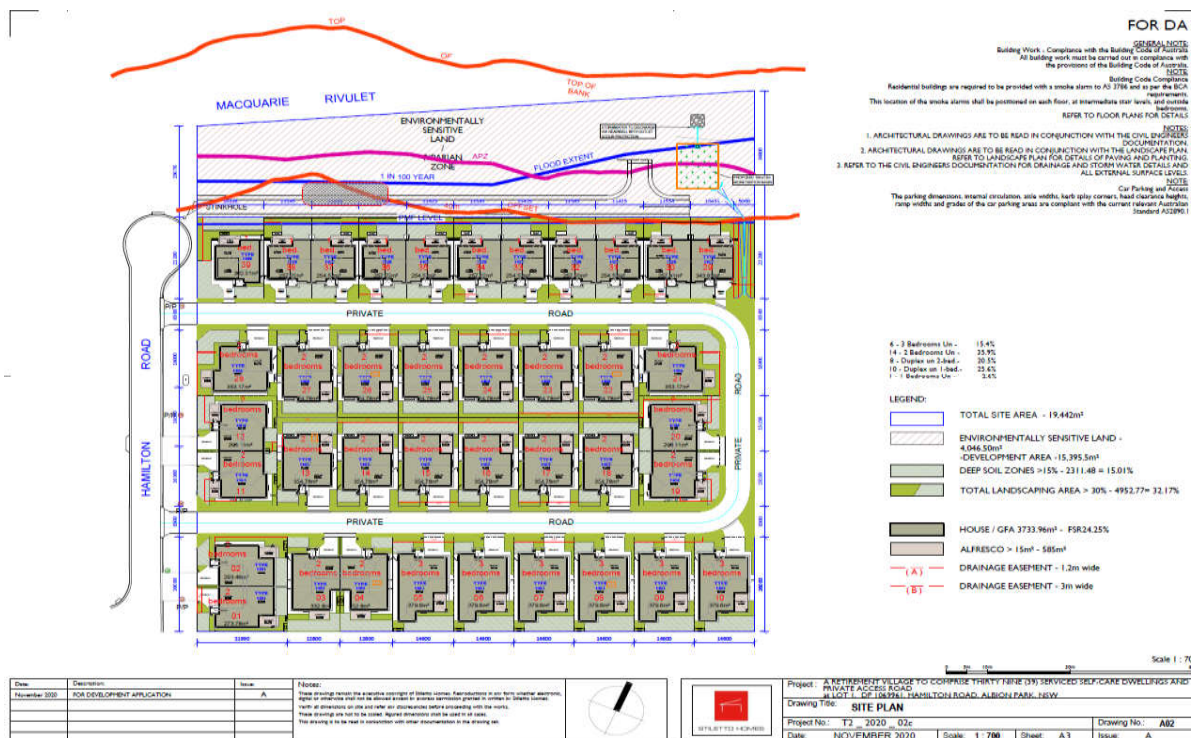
Extract of Site Plan Dwg. No. A02 Issue A dated November 2020 as prepared by Stiletto Homes.
